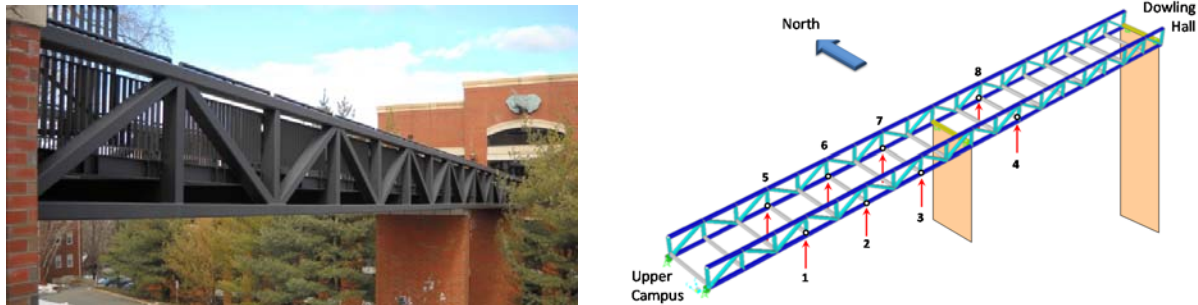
South view of the Dowling Hall Footbridge (left), and layout of accelerometers on the bridge (right)
